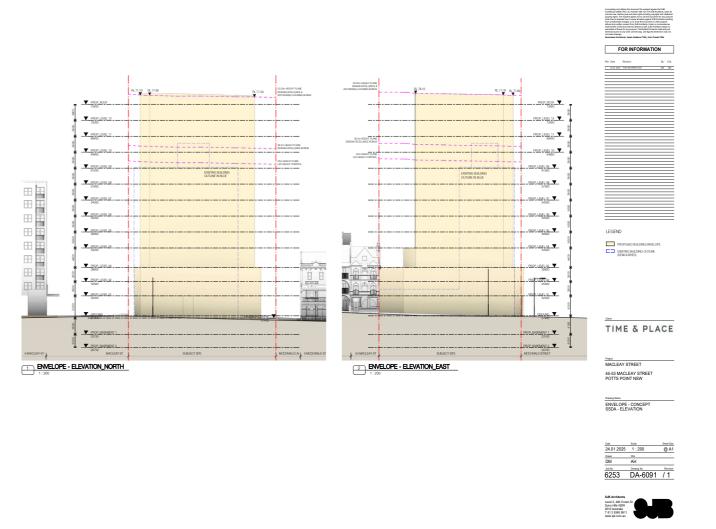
Proposed Concept Envelope, north and east elevation | SJB Architects
